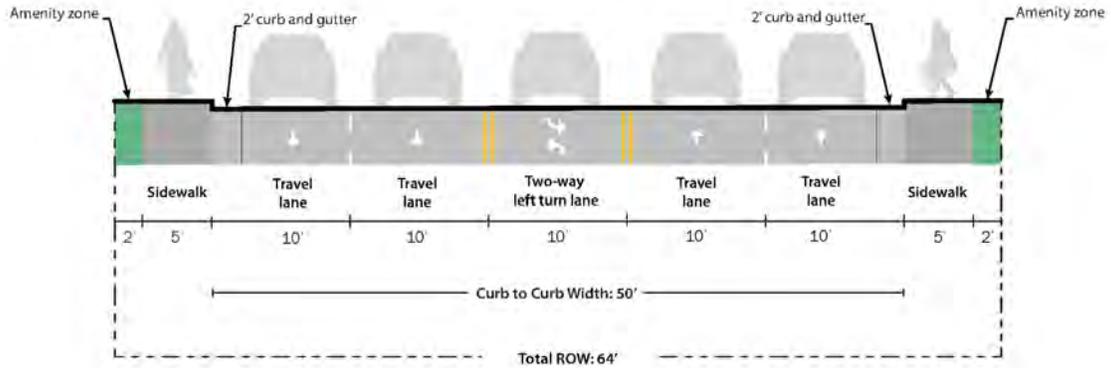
Section H (72nd Avenue West of Julian Street – Looking East)
